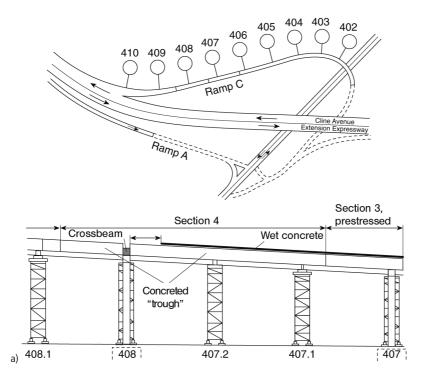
Scaffolding collapses caused by settling of temporary foundations
